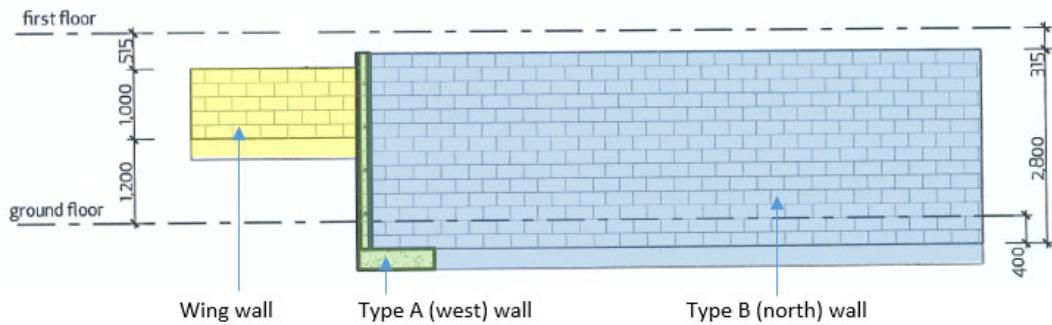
Wing wall design intent – Section 1-1 (not to scale)
